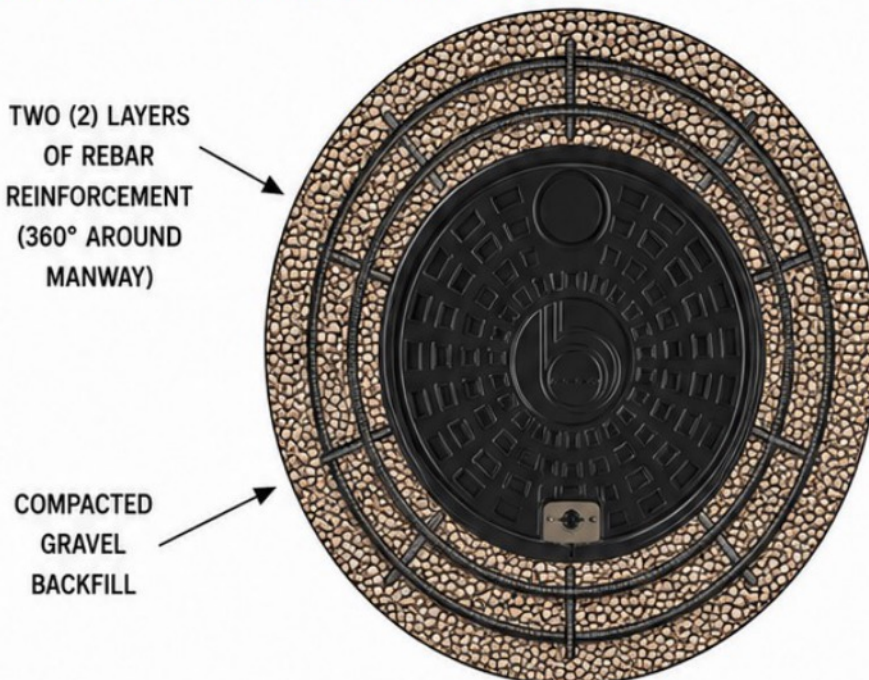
B – TOP VIEW (REBAR LAYOUT)
